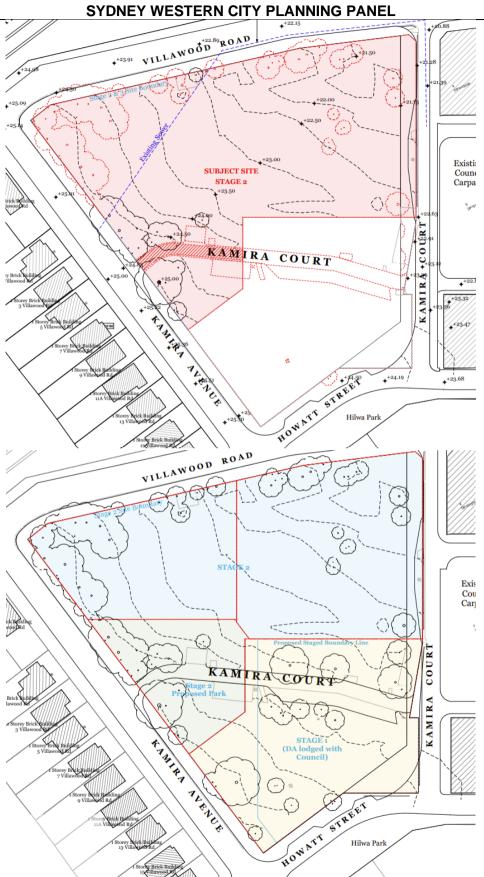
and 4: Site areas for each stage of the redevelopment of Villawood Town Centre.
